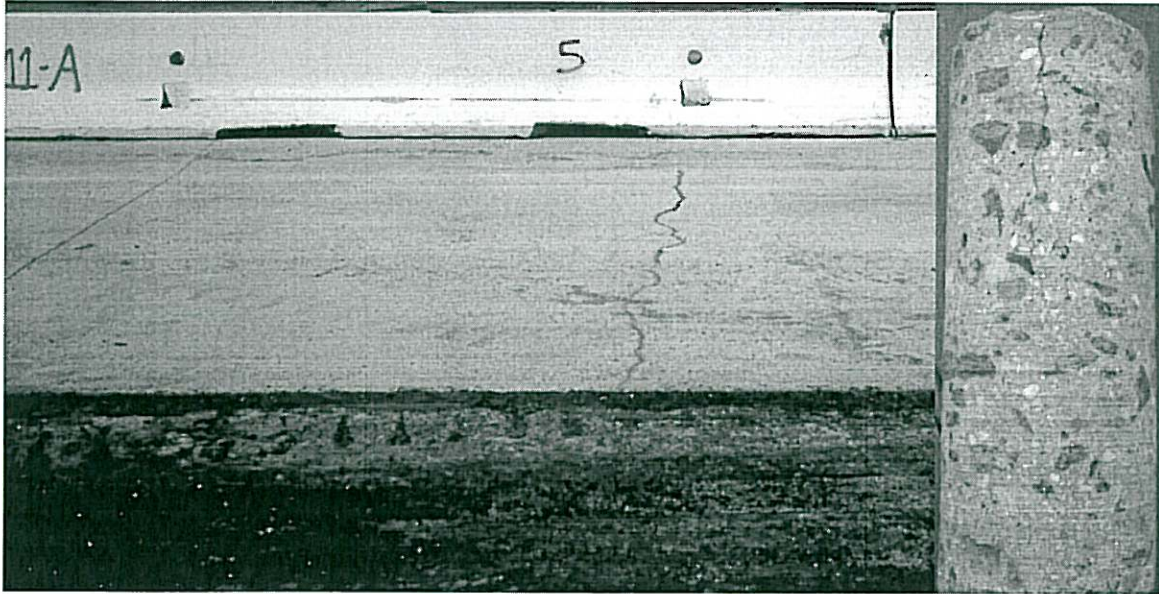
Environmental crack through the center of a pavement slab and core through an environmental crack showing top-down cracking
